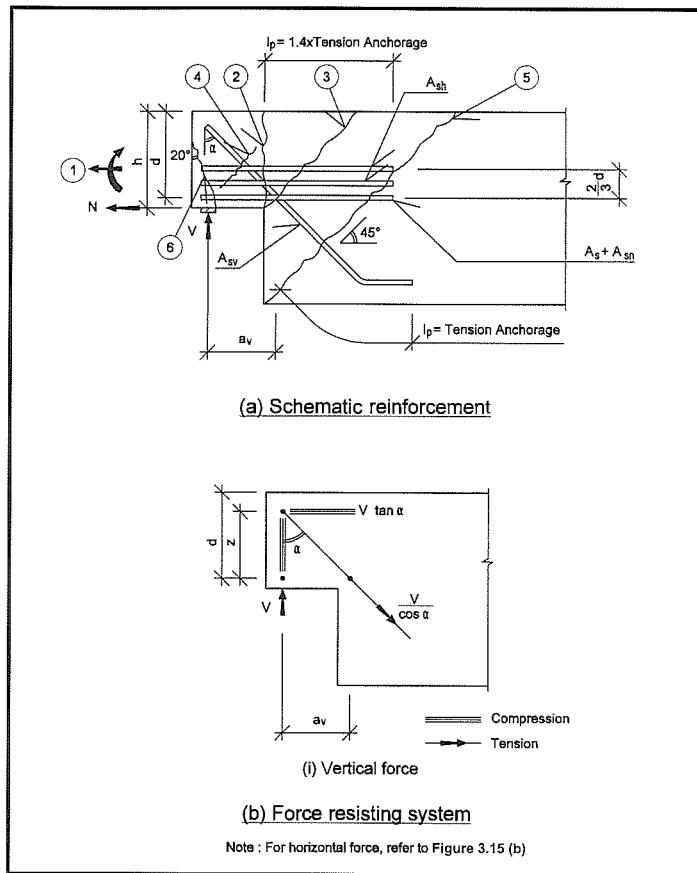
Alternative Reinforcement And Force Resisting System In Beam Half Joint
